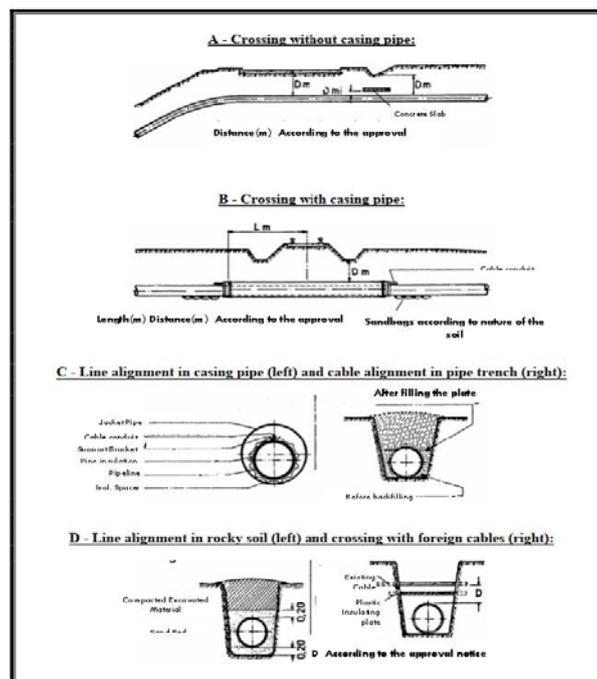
Pipe-in-pipe Profiles and Line Allignment
